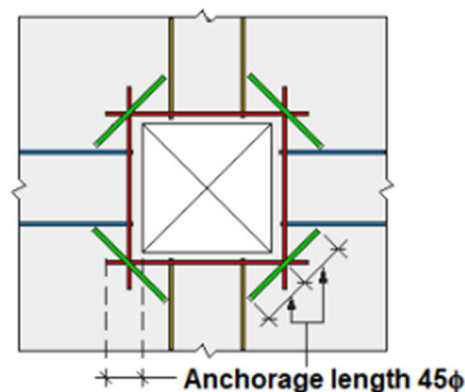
Example of an opening in a solid slab (The Concrete Centre, 2017)
